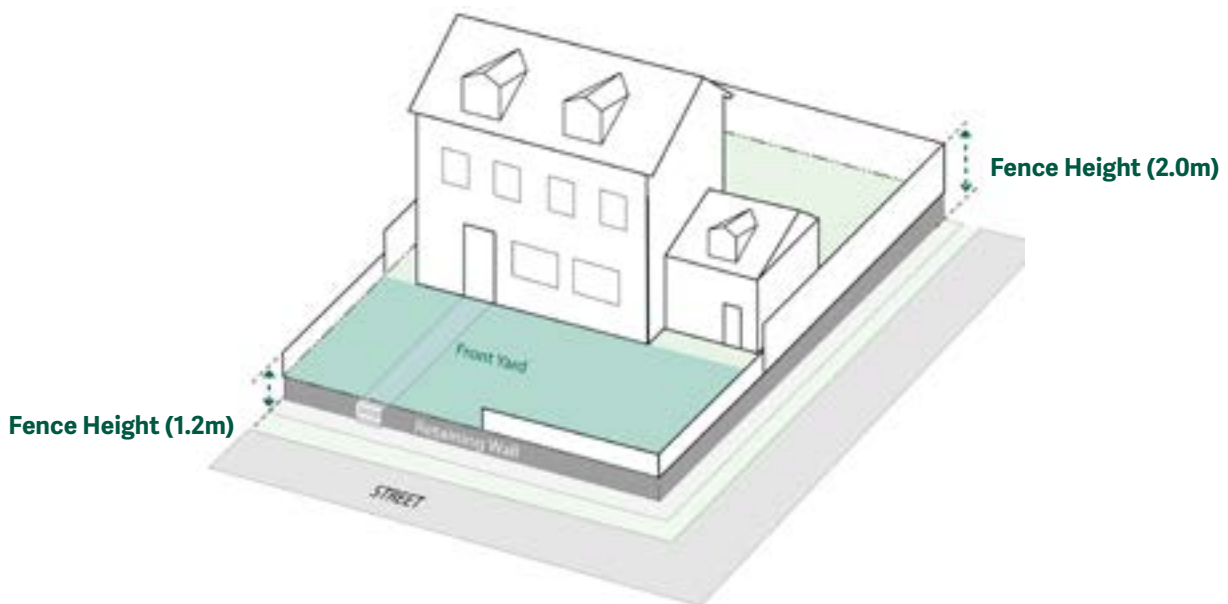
FENCE HEIGHT WITH RETAINING WALL
